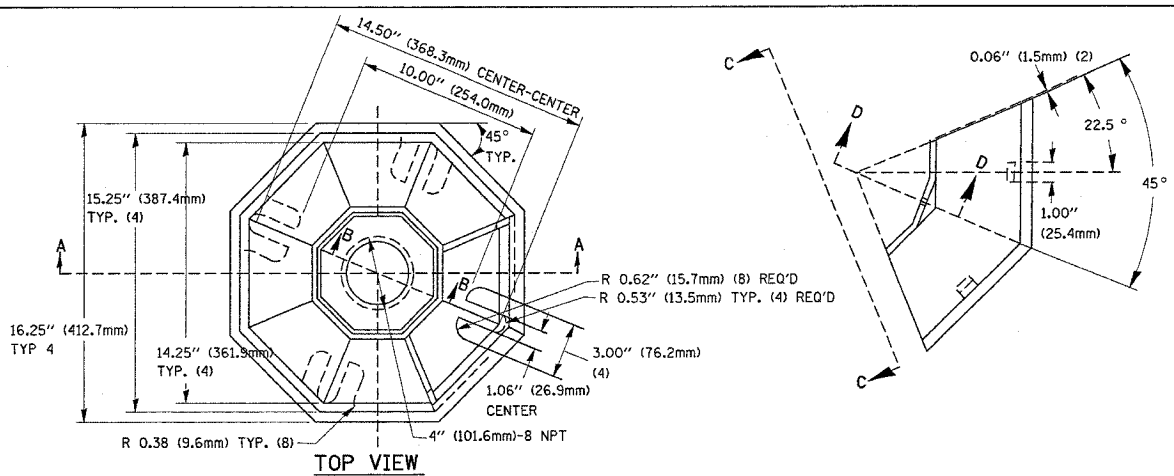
DETAIL HANDHOLE TO INTERCEPT EXISTING CONDUIT
